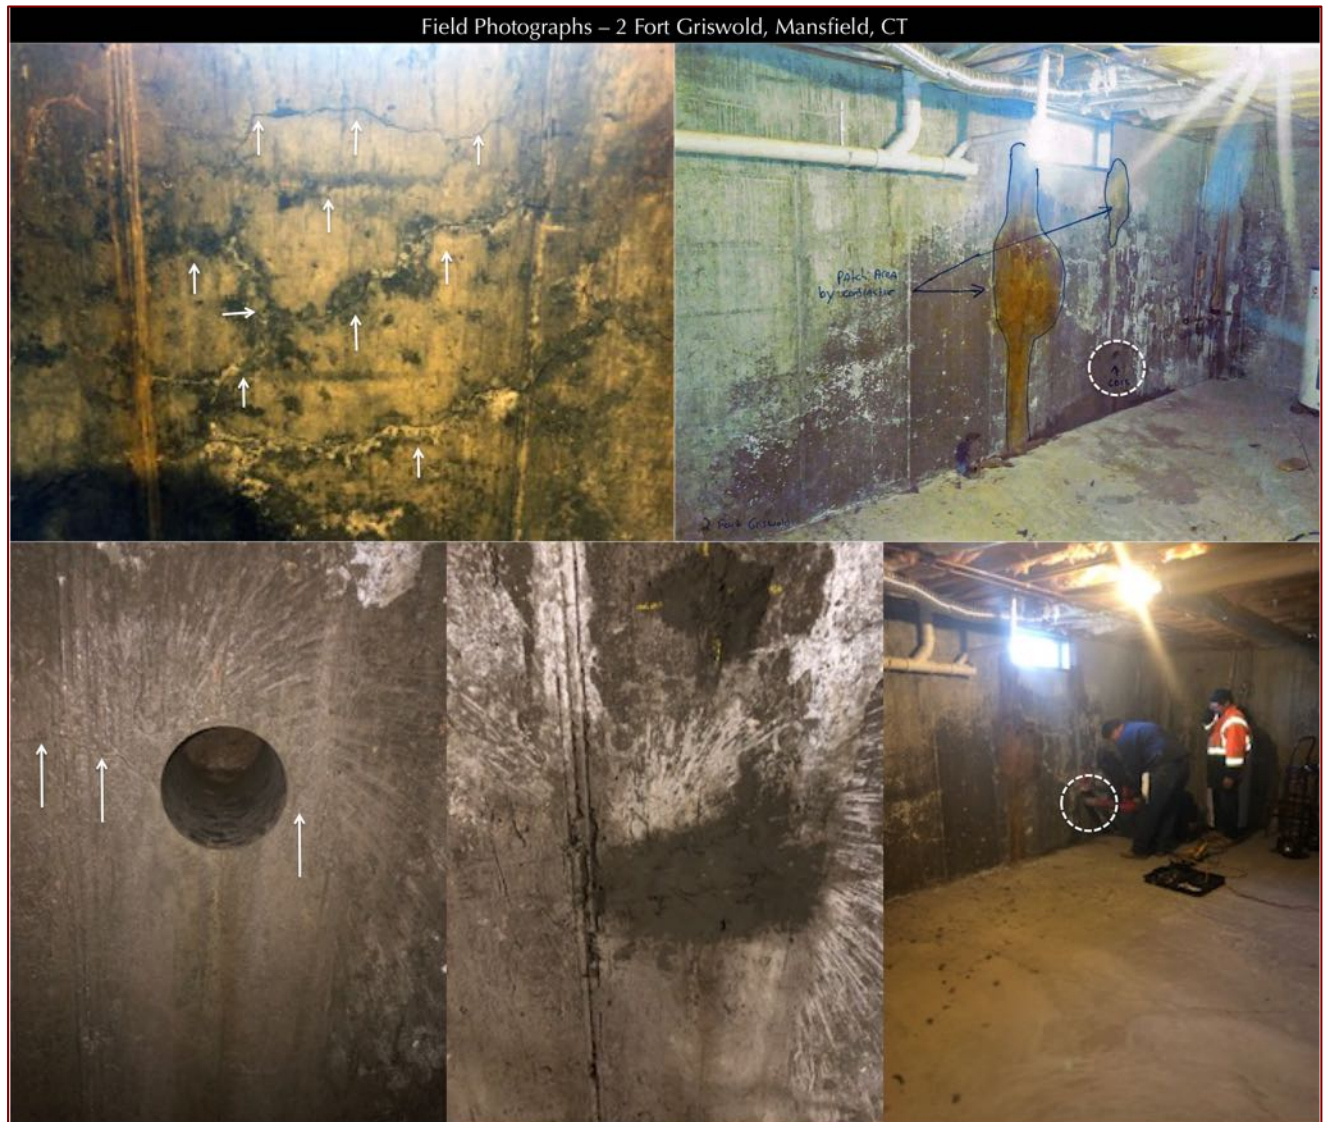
Field photographs of concrete foundation at 2 Fort Griswold showing extensive cracking of the foundation wall and location of the core for the present study retrieved from over a visible crack.
